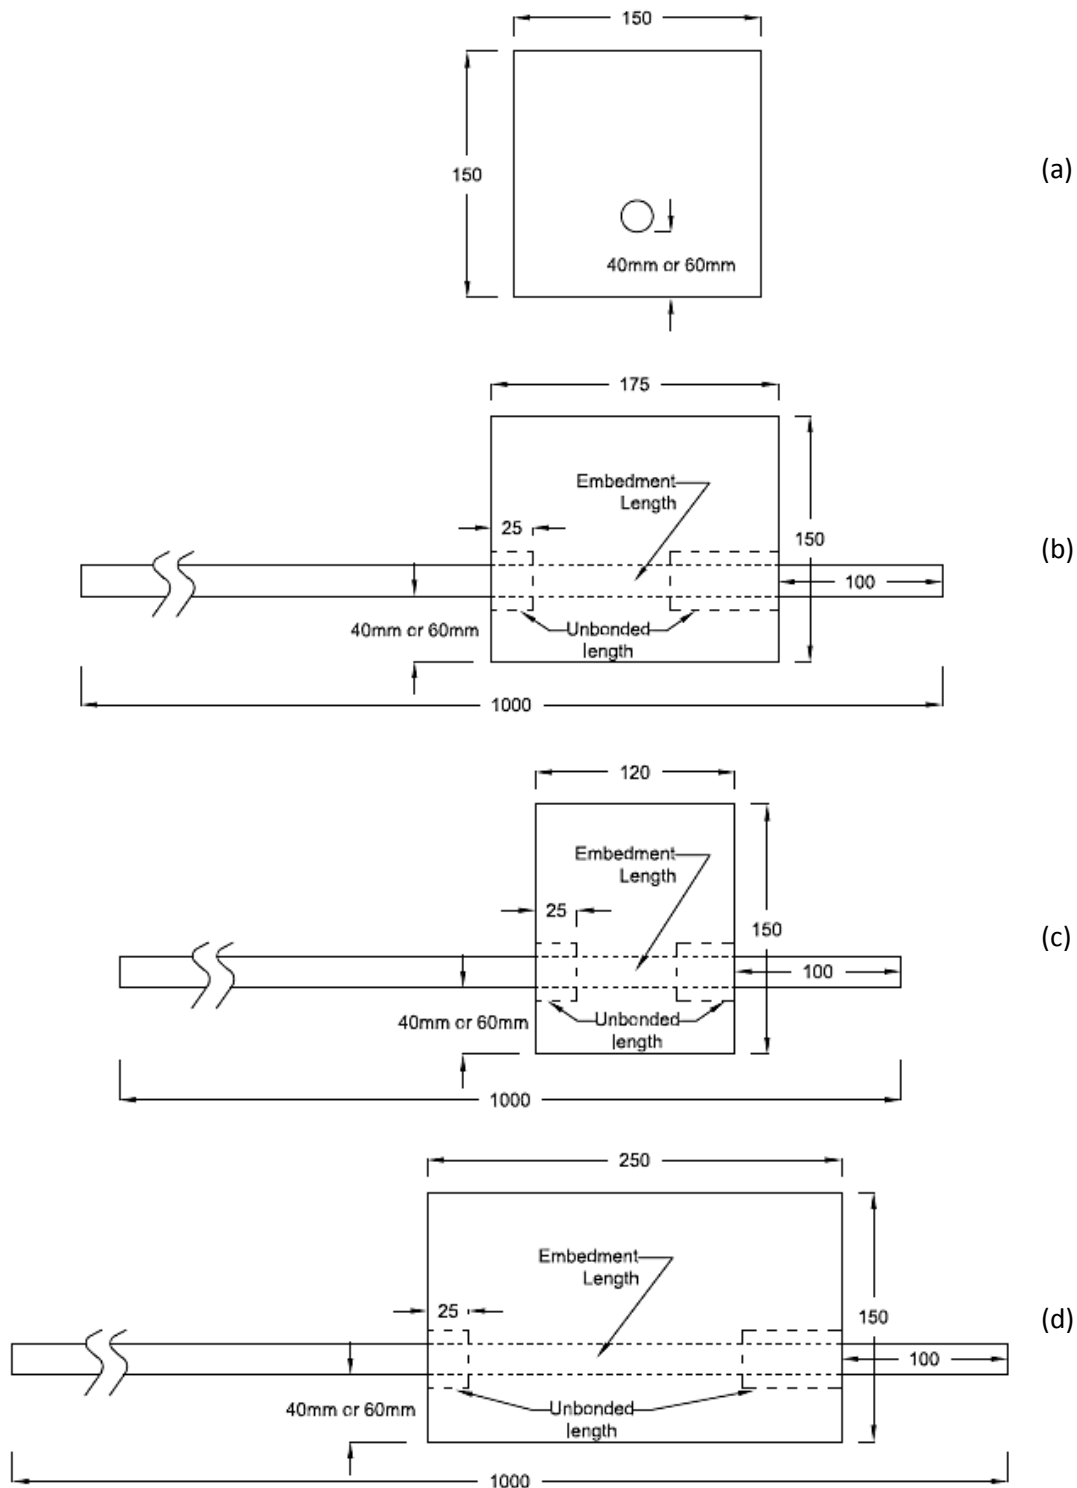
Pullout Specimen Configuration: (a) cross section perpendicular to longitudinal axis of bar; (b)  $3d_b$  and  $7d_b$  specimen dimensions; (c)  $5d_b$  specimen dimensions; (d)  $10d_b$  specimen dimensions.
